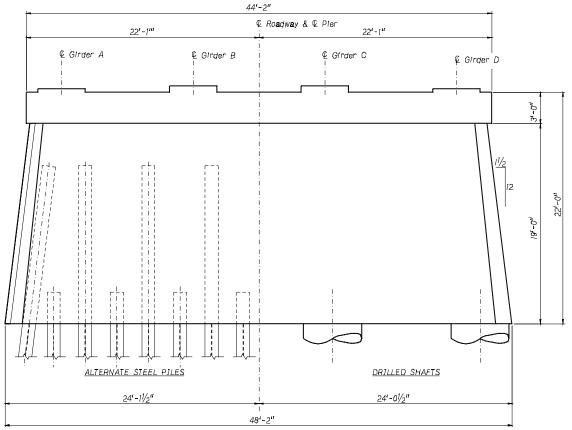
Pier Elevation Showing Alternate Deep Foundation Elements
